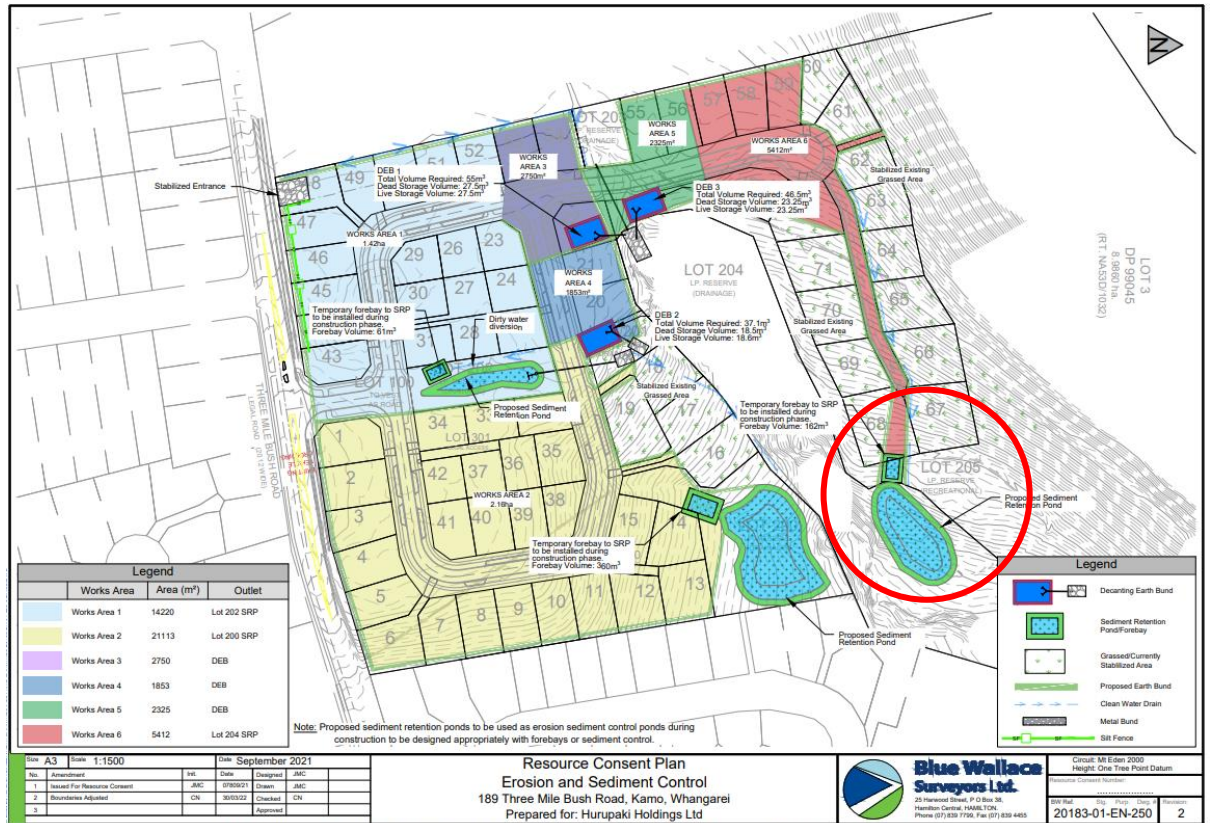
Potential conflict between pedestrian route and stormwater forebay
